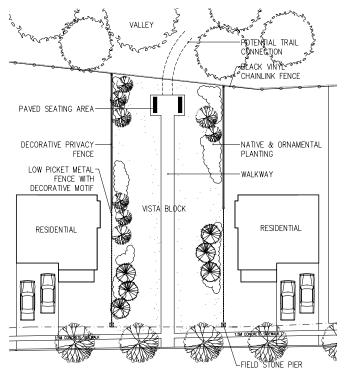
Demonstration Plan - Typical Vista Block
